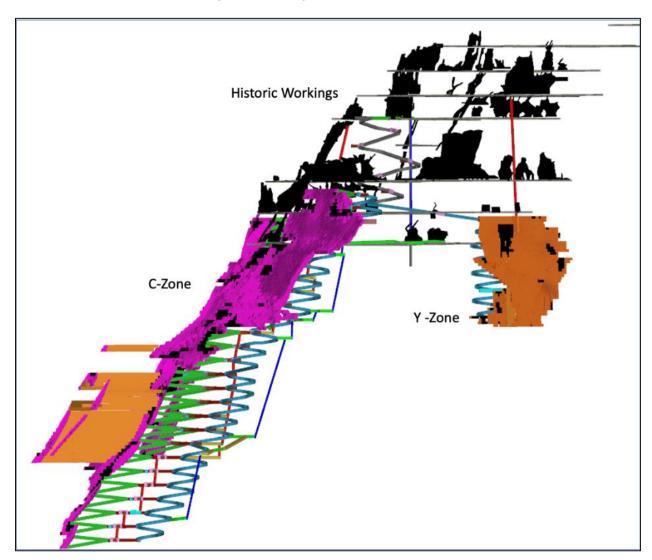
Long Section Looking South – Mineral Resources and UG Workings
